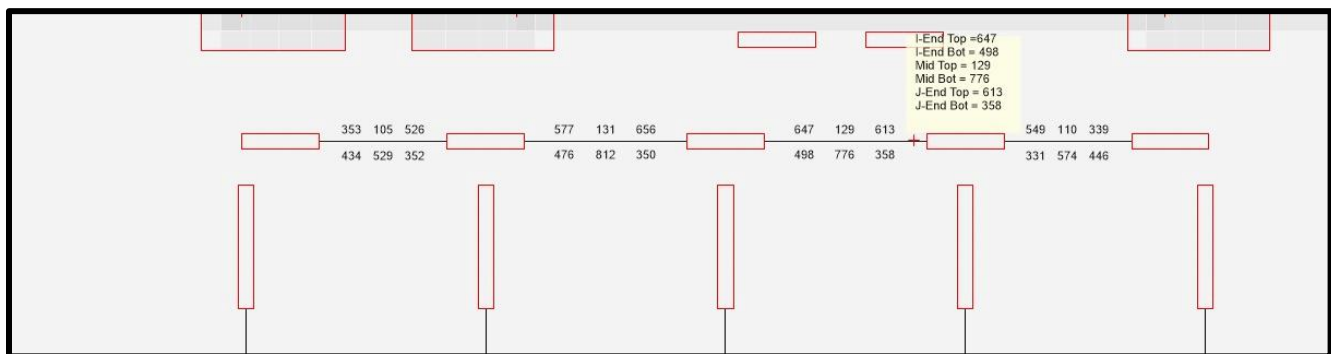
Interior Beam Flexural Longitudinal Reinforcement
